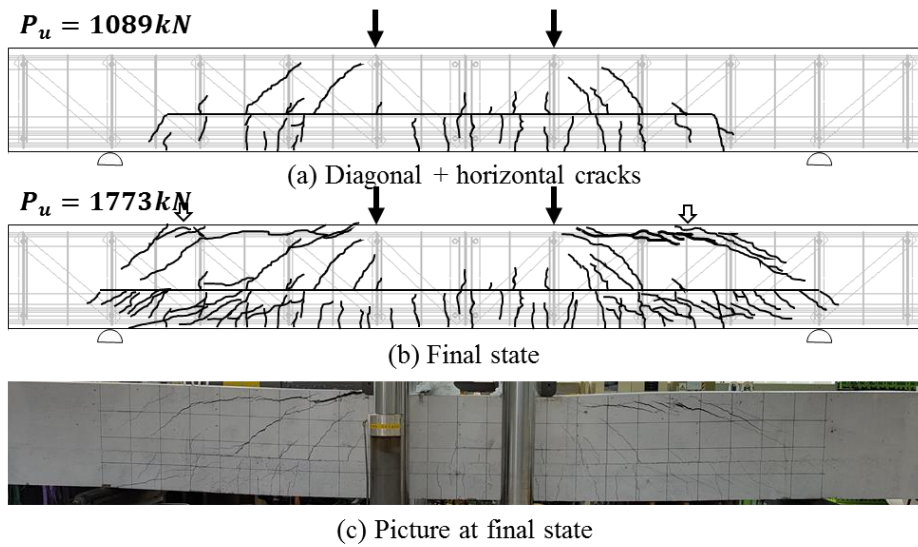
Failure mode and crack pattern of RC-S4 specimen
